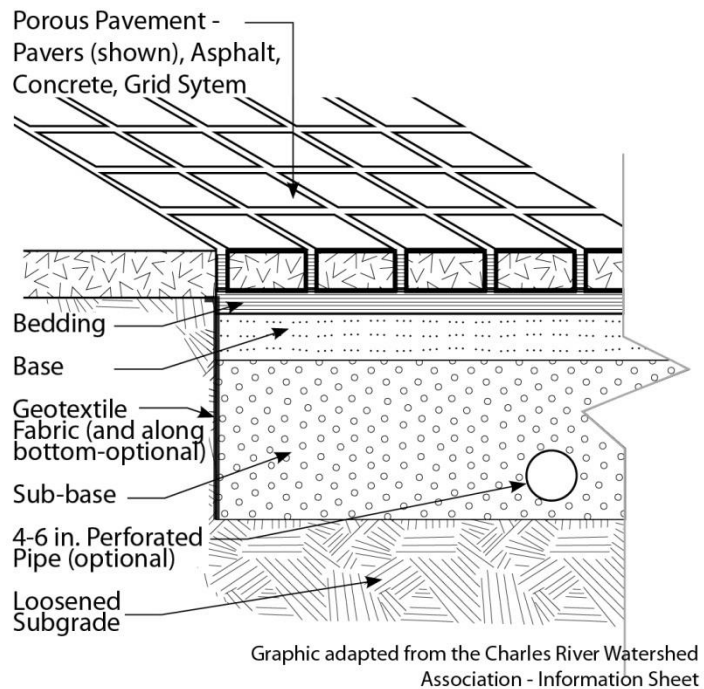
Schematic of typical permeable pavement surface and subgrade.
